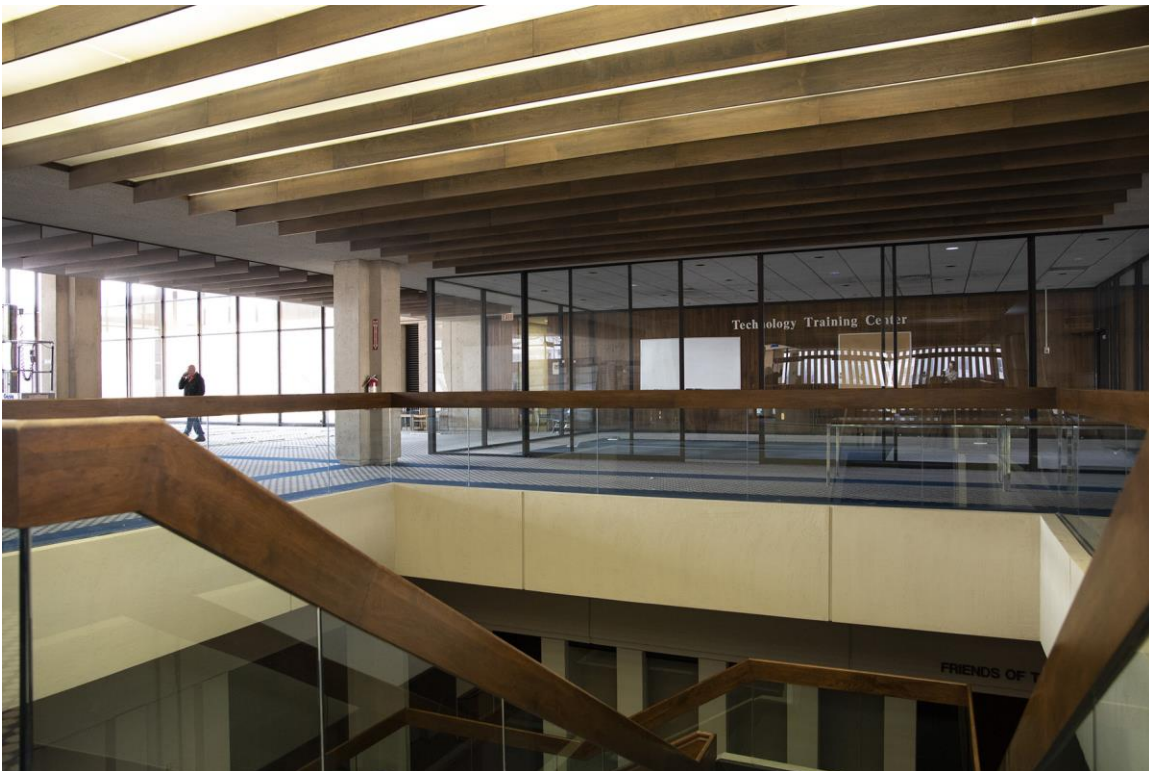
Interior View of Added Opening and Ornamental Stair to Basement Level
